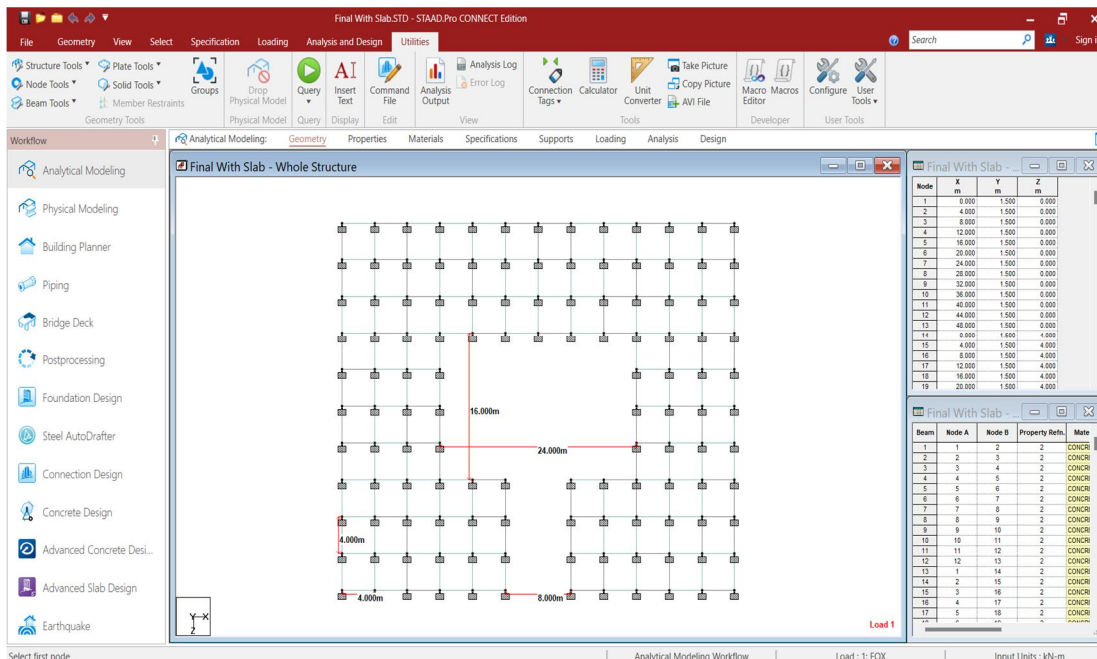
Plan for the building Dimensions of the beams, columns and slabs are provided in the below subsection.
